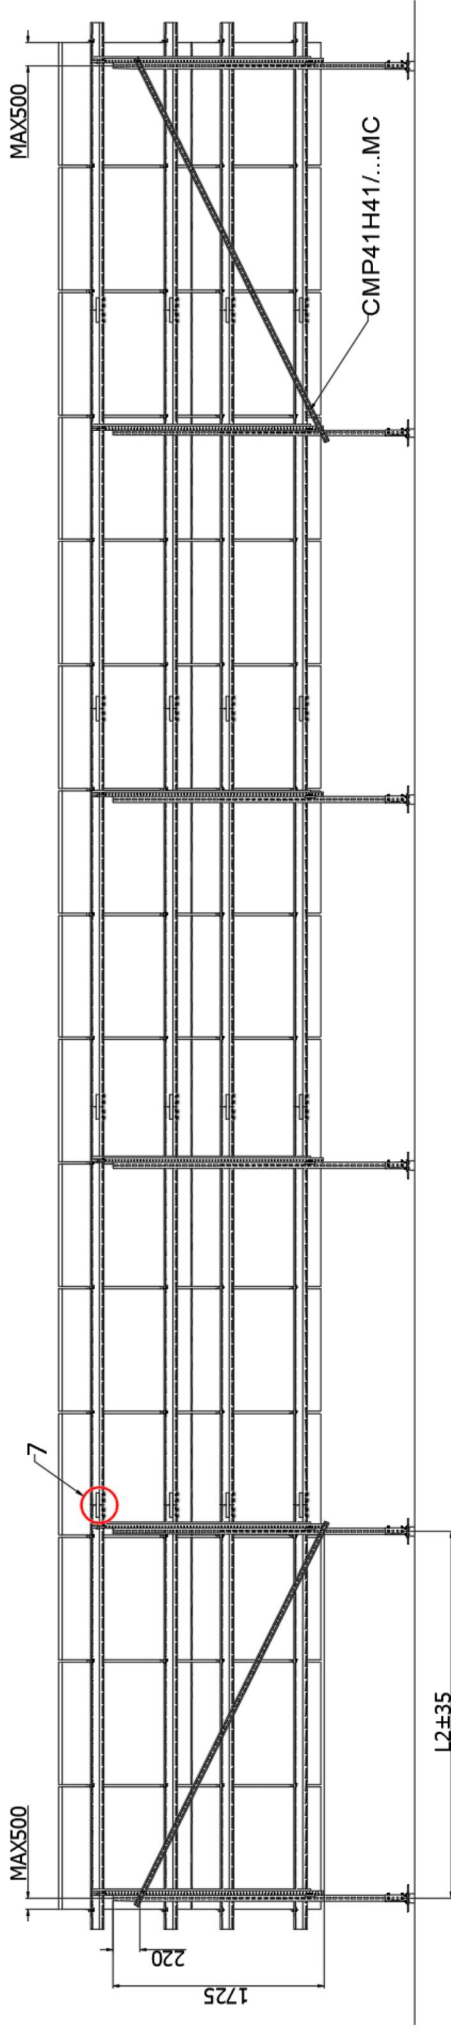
View of the structure from the north side with bracing spacing No. 2
